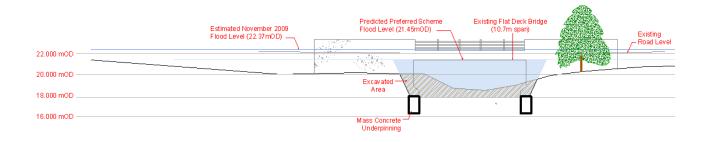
Proposed Works at the R446 Road Bridge in Craughwell
